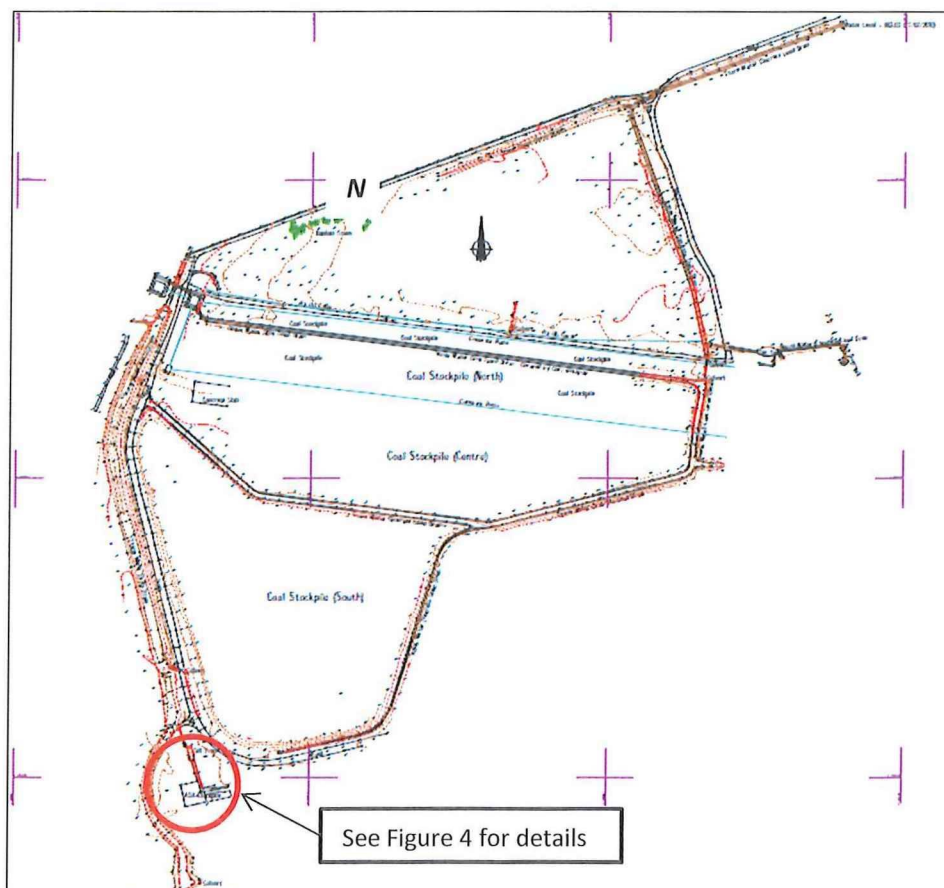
Layout of emergency ash offloading area, collecting storm water canal and coal stockyard
